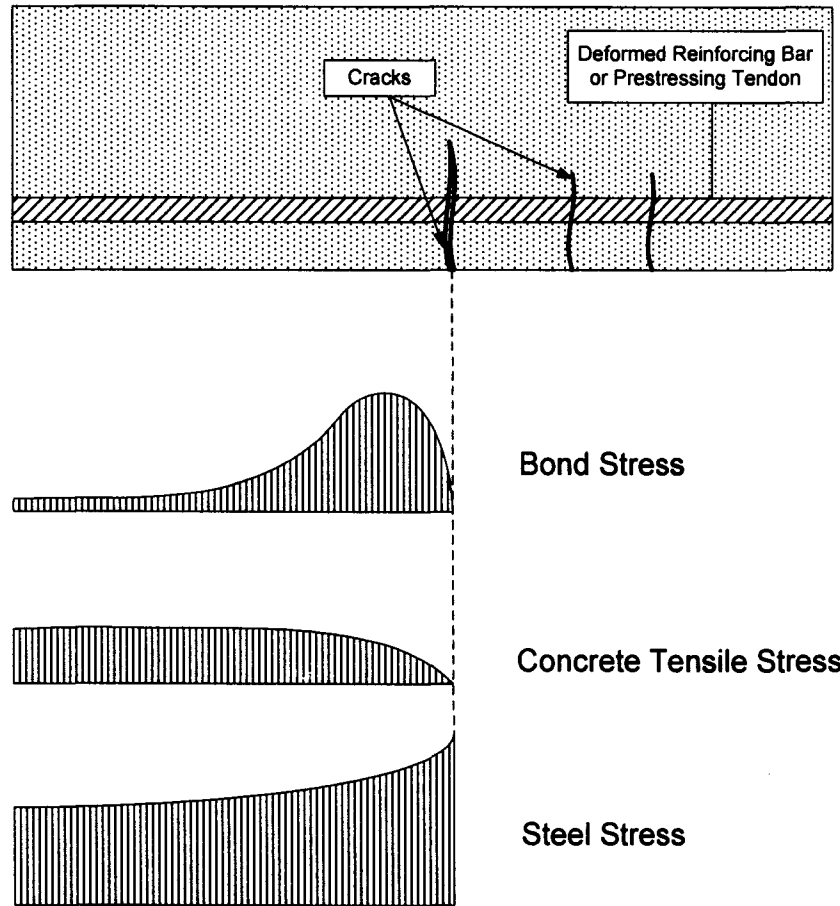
Distribution of bond stress, concrete tensile stress, and steel stress beside a crack
